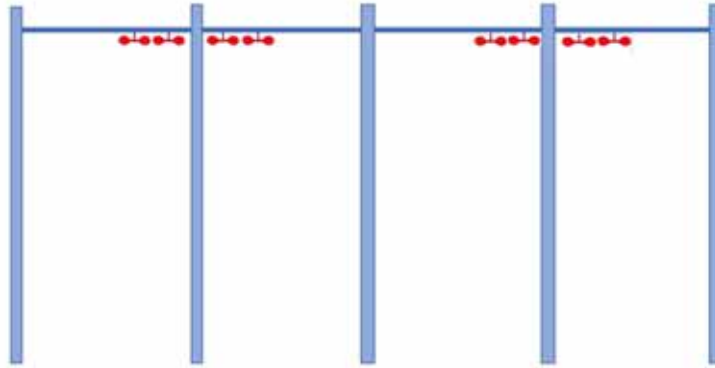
Stockbridge Damper Placement Example 1
